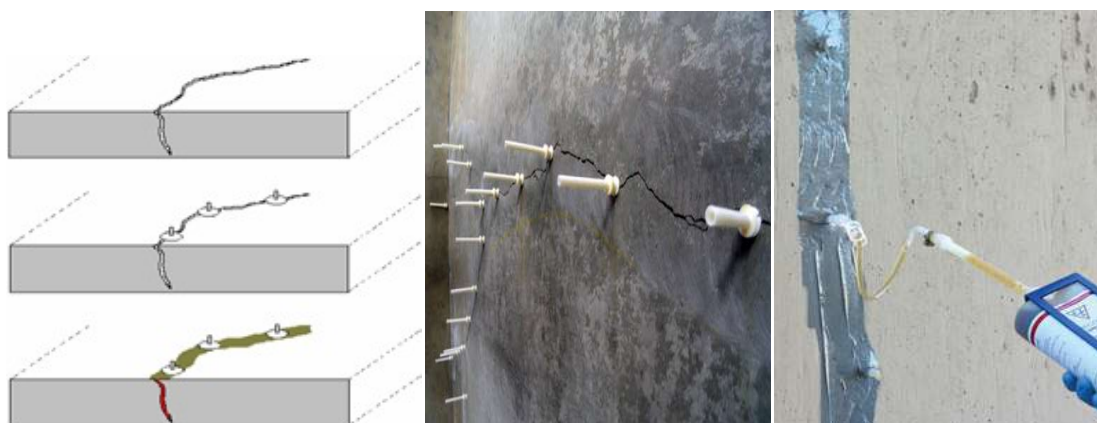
Method of concrete crack repair with Epoxy Resin
